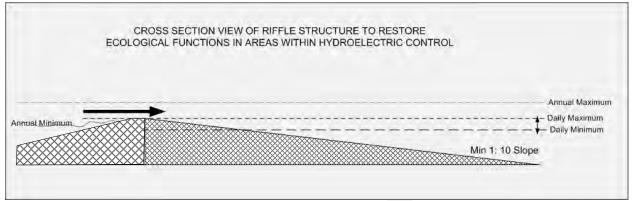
Cross section of proposed riffle structures placed in the outlet areas of small creeks where they intersect Niagara River flows within the GIP controlled elevations. Conceptual design originally proposed by Dr. R.J. Planck for Ussher's Creek and Grassy Brook Creek mouths.
